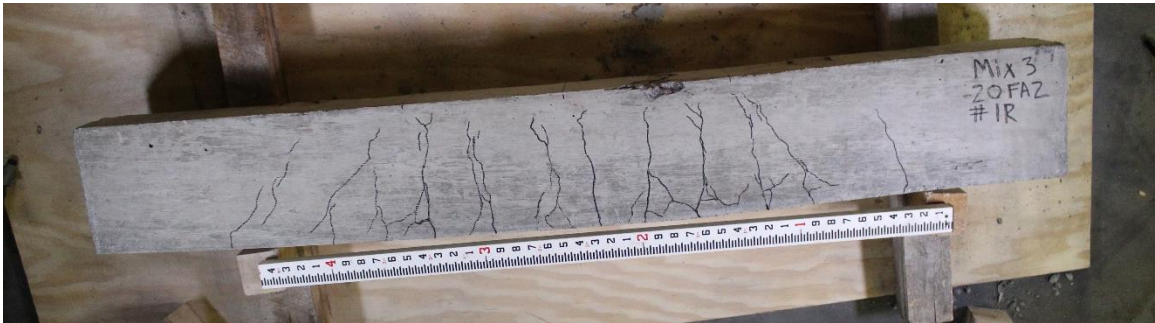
Mixture 3 (20FA2) beam #1R: concrete beam side view.
